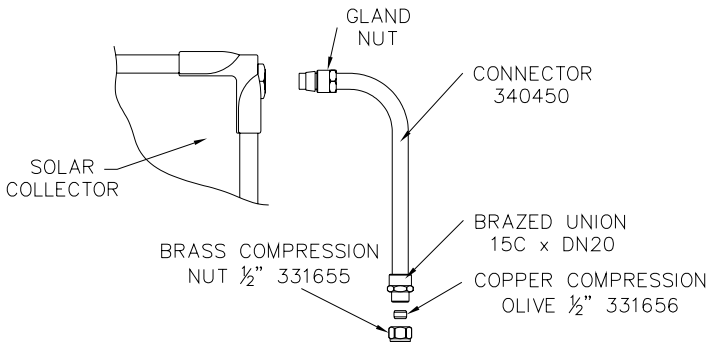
DETAIL C – HOT SENSOR HOUSING ASSEMBLY – CONETITE FITTING
